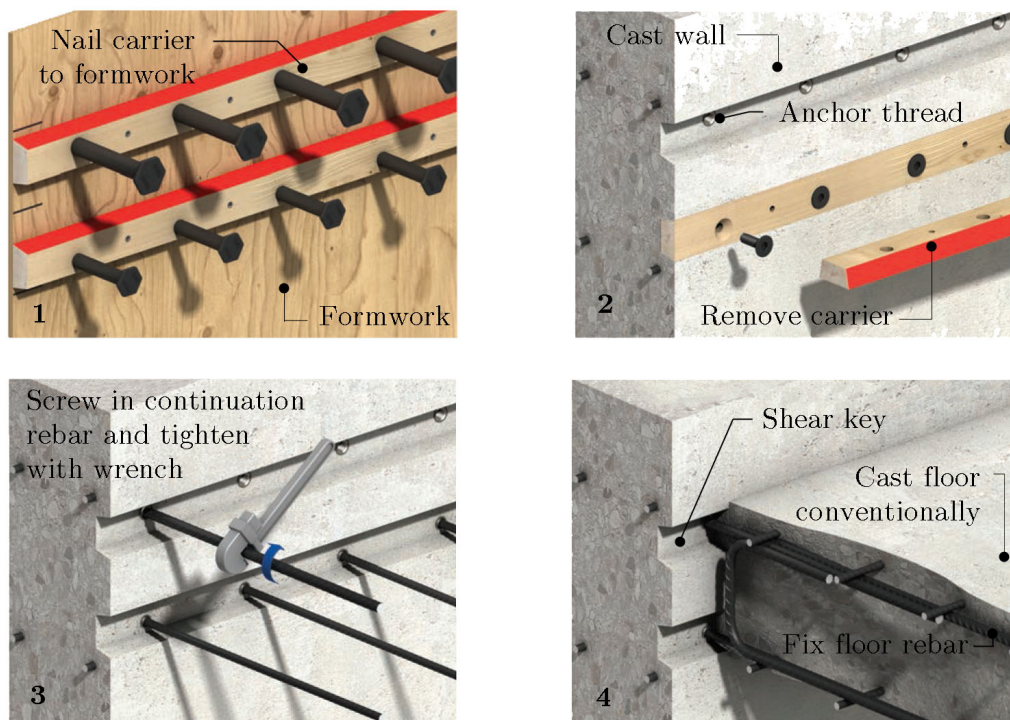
Cast-in Anchor with Mechanical Couplers (reworked from Ancon Building Products (2014))
